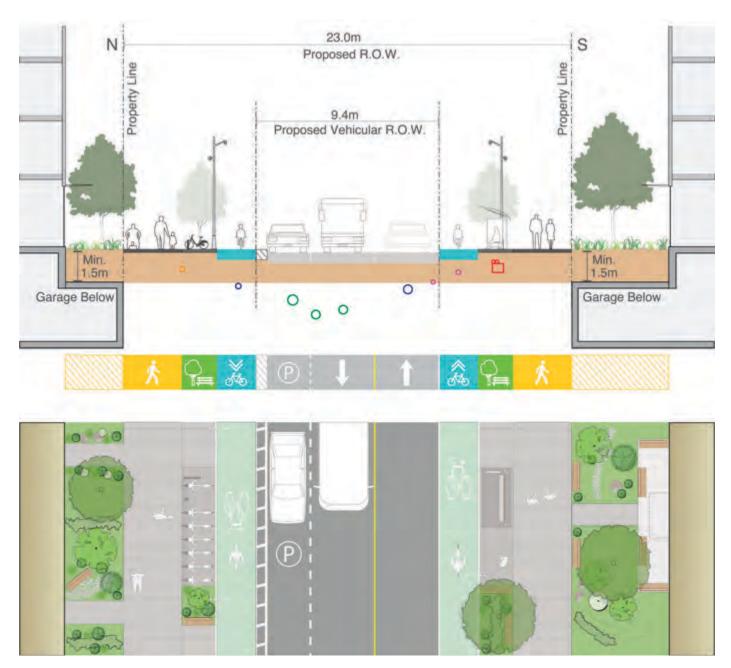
Section and Plan of Green Boulevard and Bike Share Station (North side), and Green Boulevard and TTC Shelter (South side) - Recommended Final Conditions
